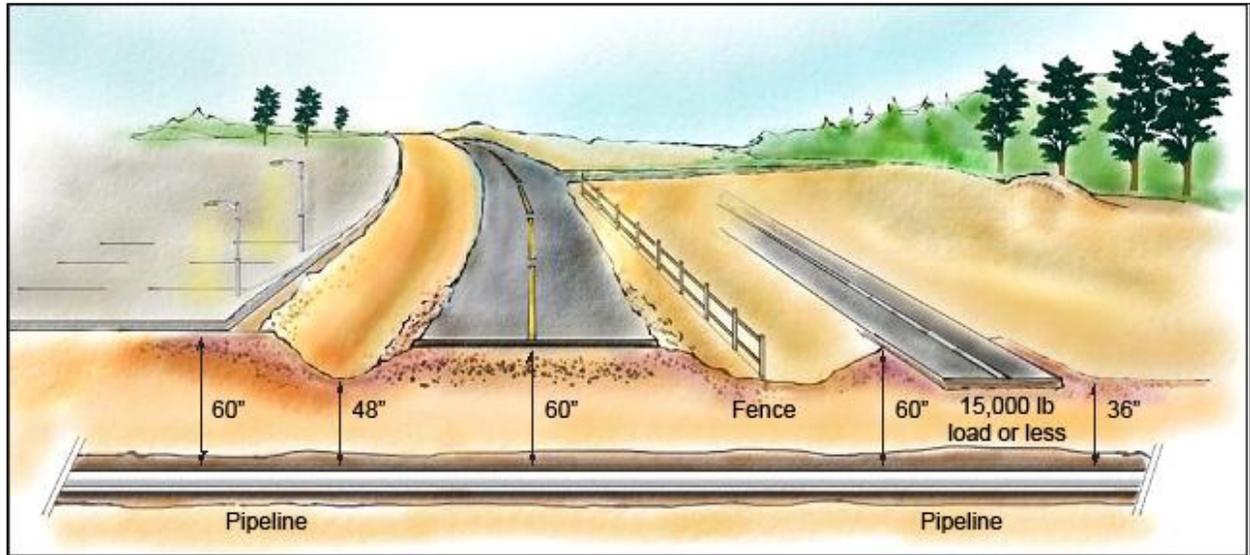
ALL ROADS, PARKING LOTS, DRIVEWAYS, AND HEAVY EQUIPMENT CROSSINGS MUST BE APPROVED PRIOR TO INSTALLATION. SEE SAMPLE BELOW.
